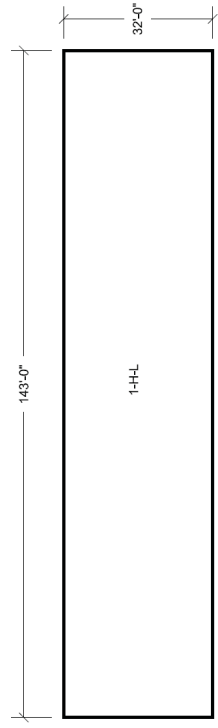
H.6-61: PUMP HOUSE SOUTH WALL LOOKING SOUTH
